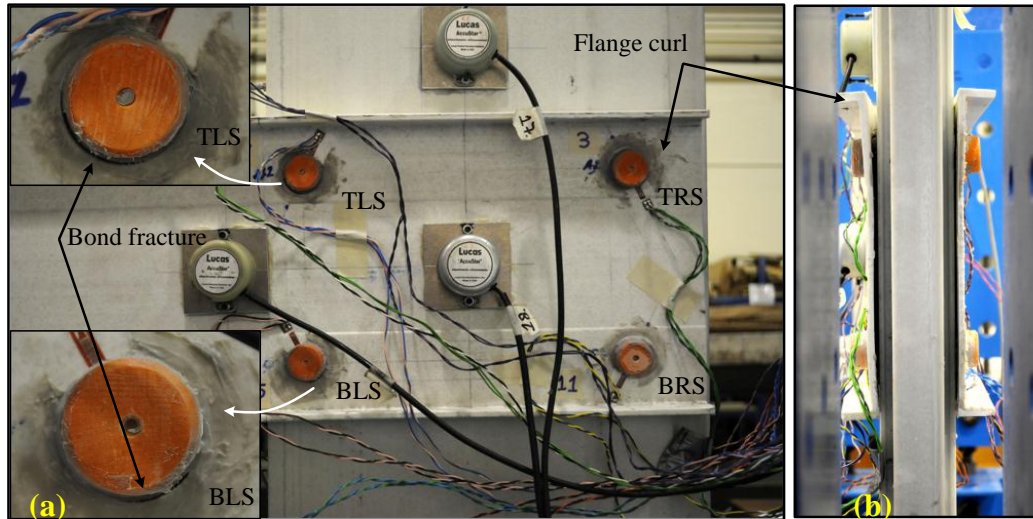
SAJ-1 failure mode: (a) bond fracture; (b) flange curl.
